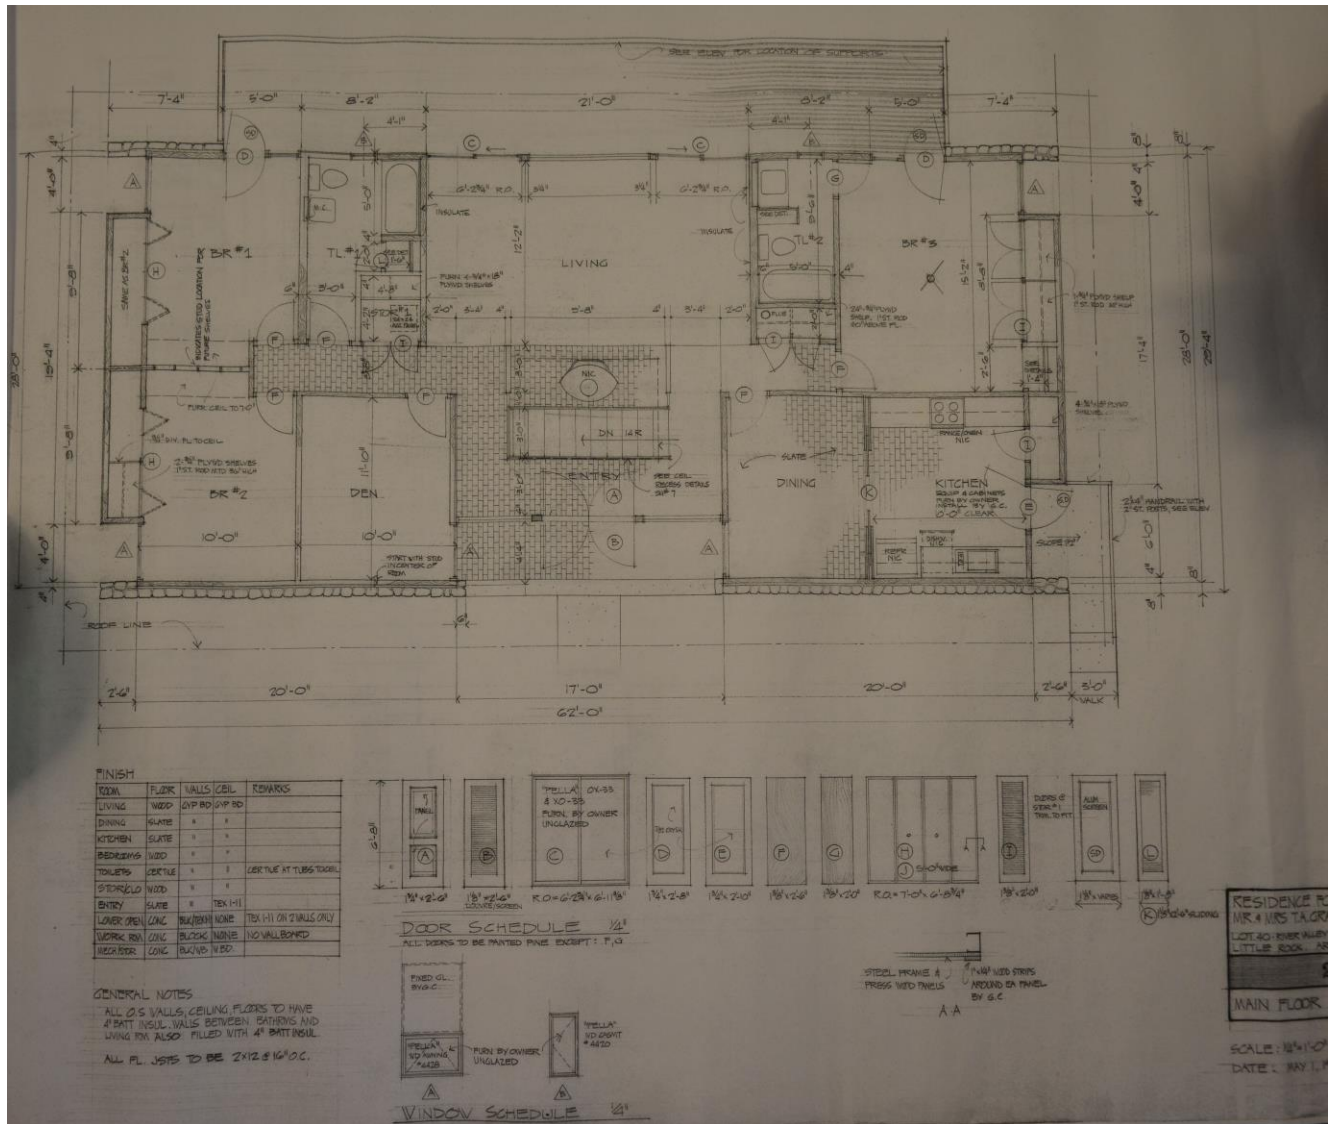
Main Floor plan of the Thomas Gray House, 1963.
